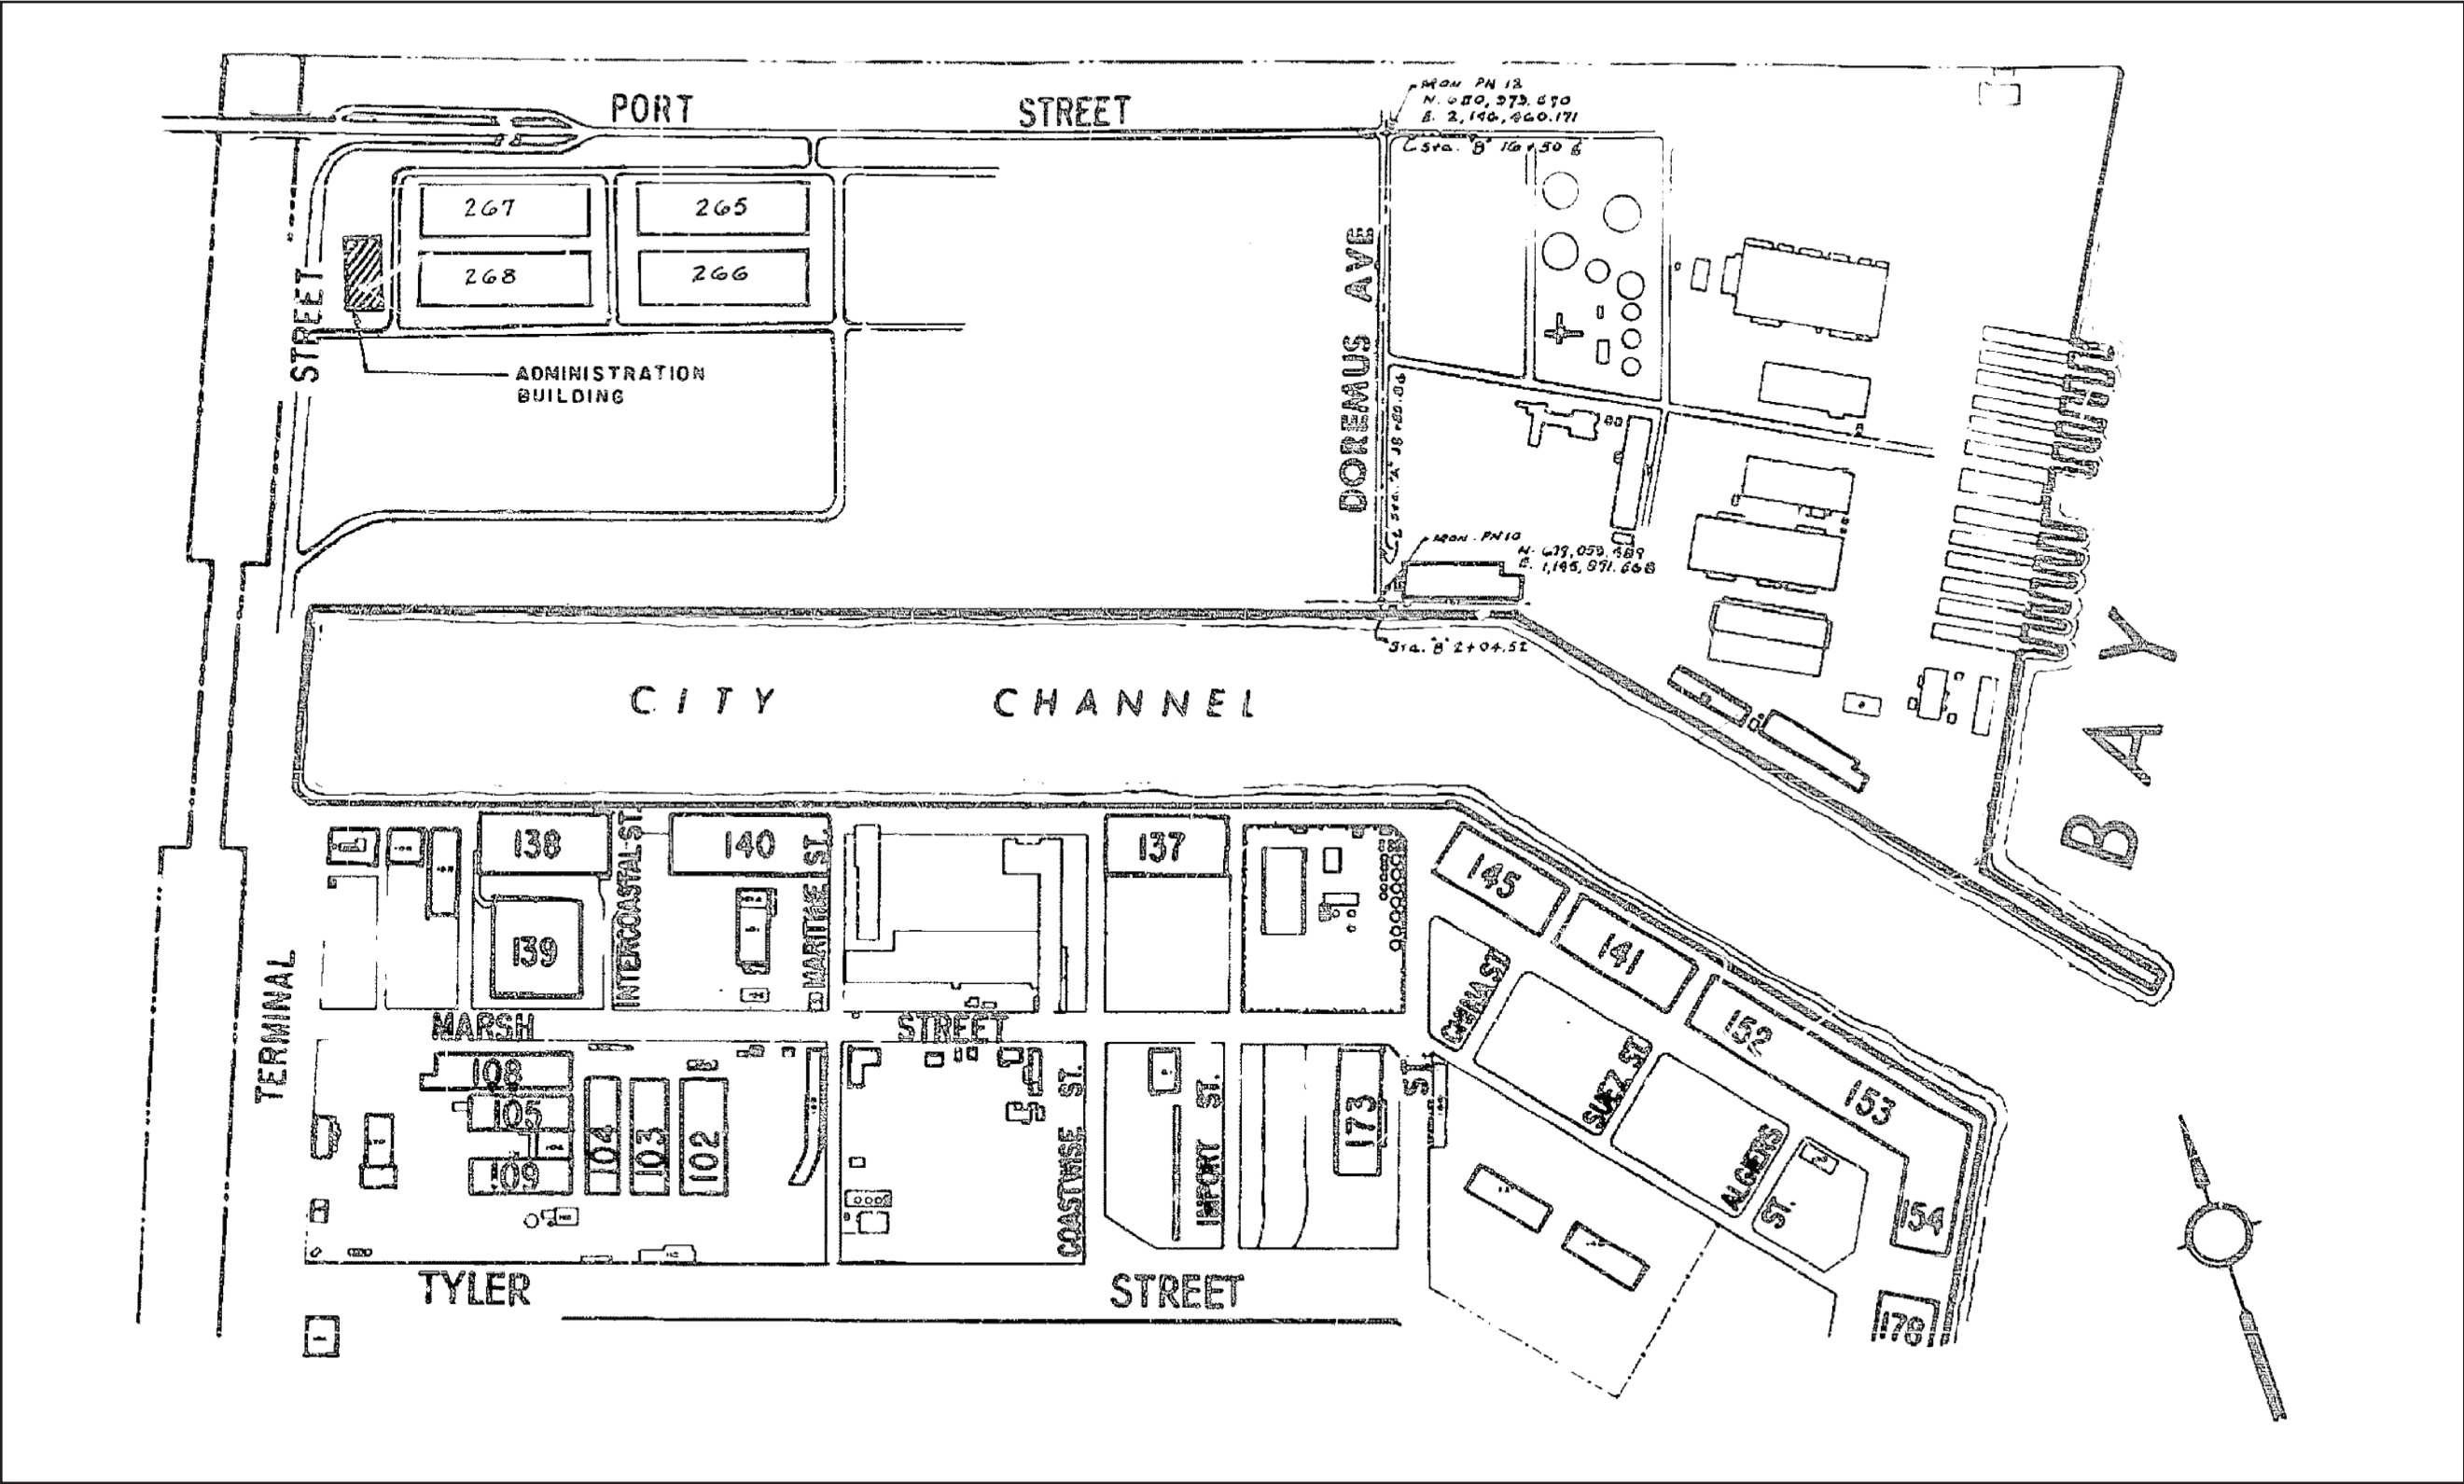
1966 site plan drawing of Port Newark indicating the proposed location for the Port Authority Administration Building (Building 260) (Source: Port of New York Authority 1966).
